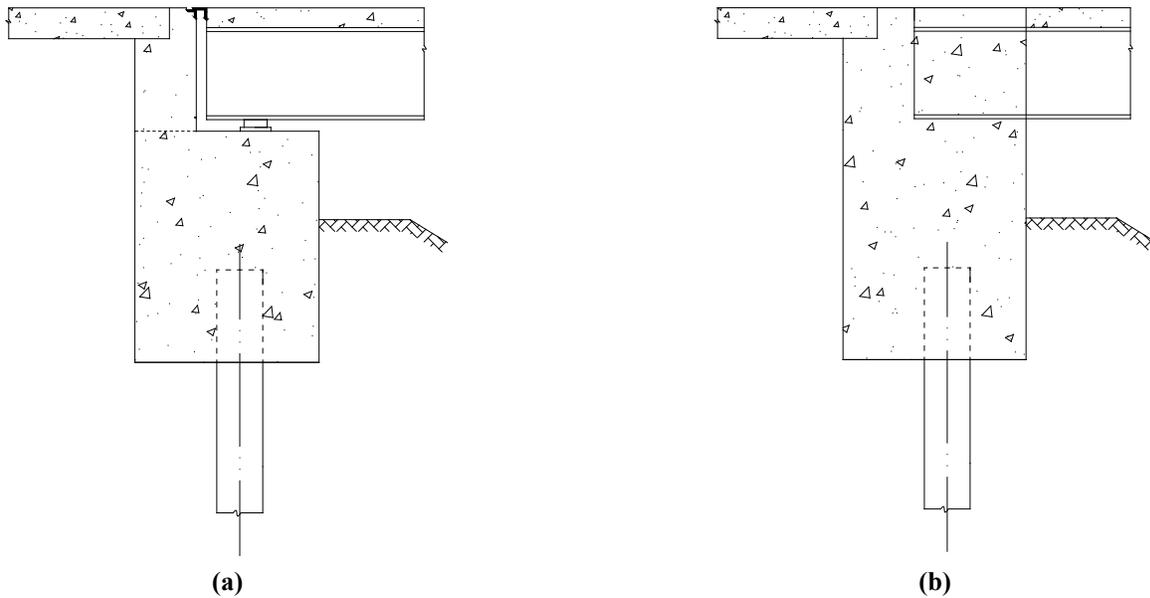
Conversion of a bridge with moveable deck joints at the superstructure-abutment interface with integral abutment (a) before conversion, and (b) after conversion.
